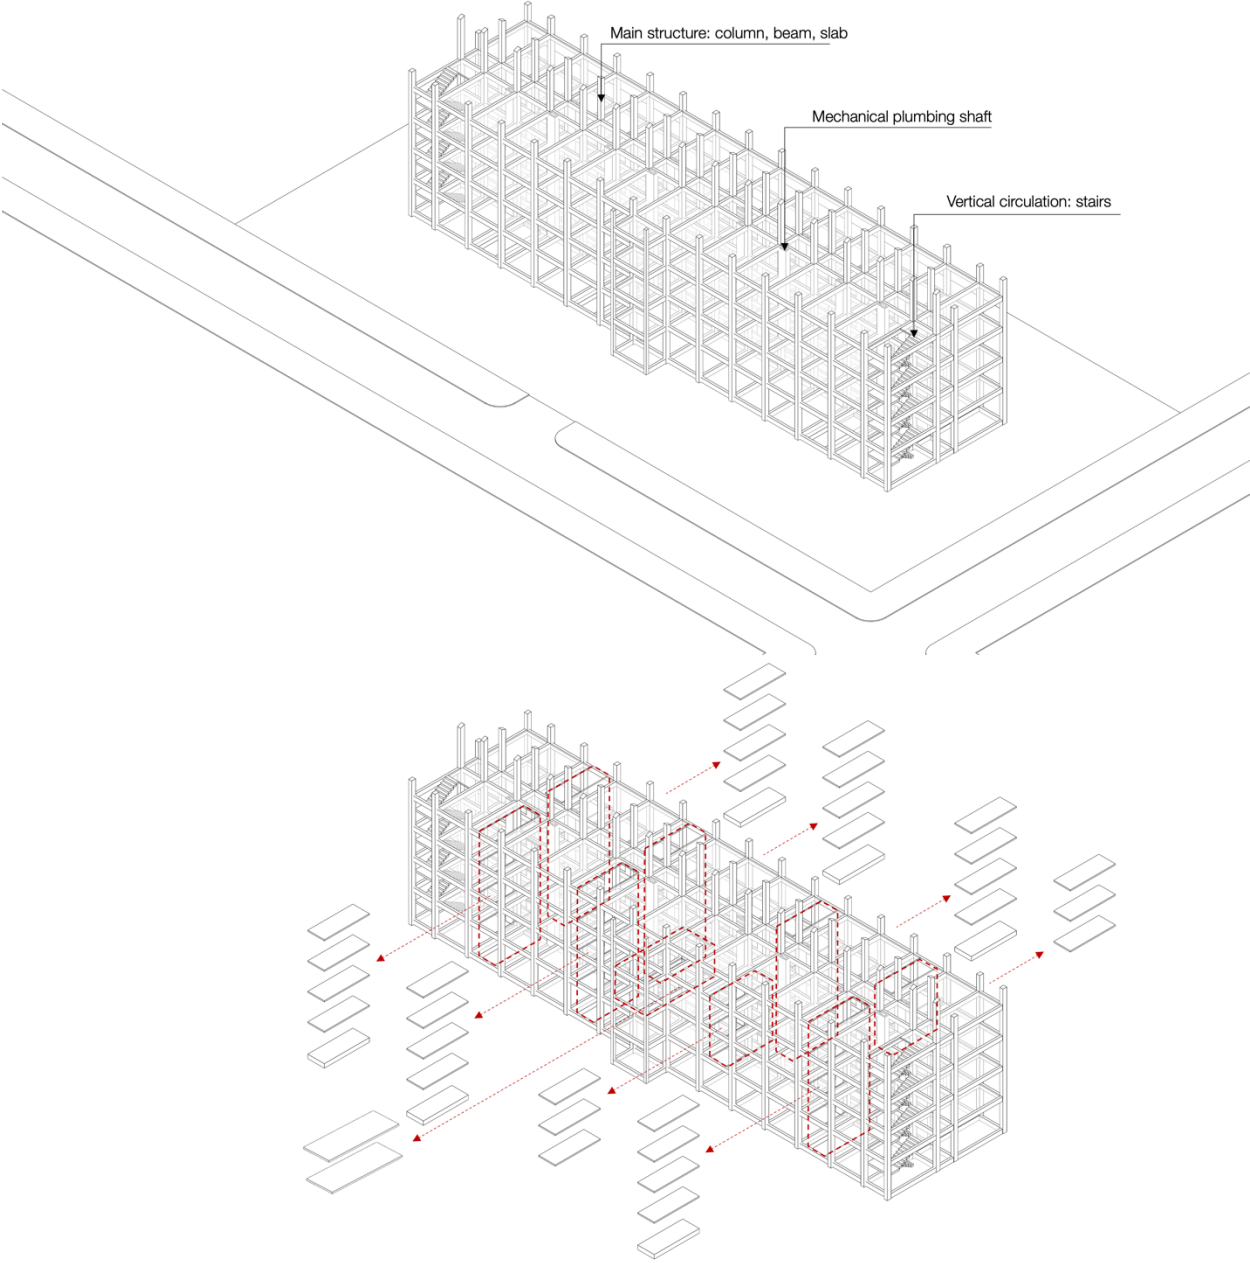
Building Frame Transformation: (a) Main Frame; (b) Cutting Frame to Creating Voids
